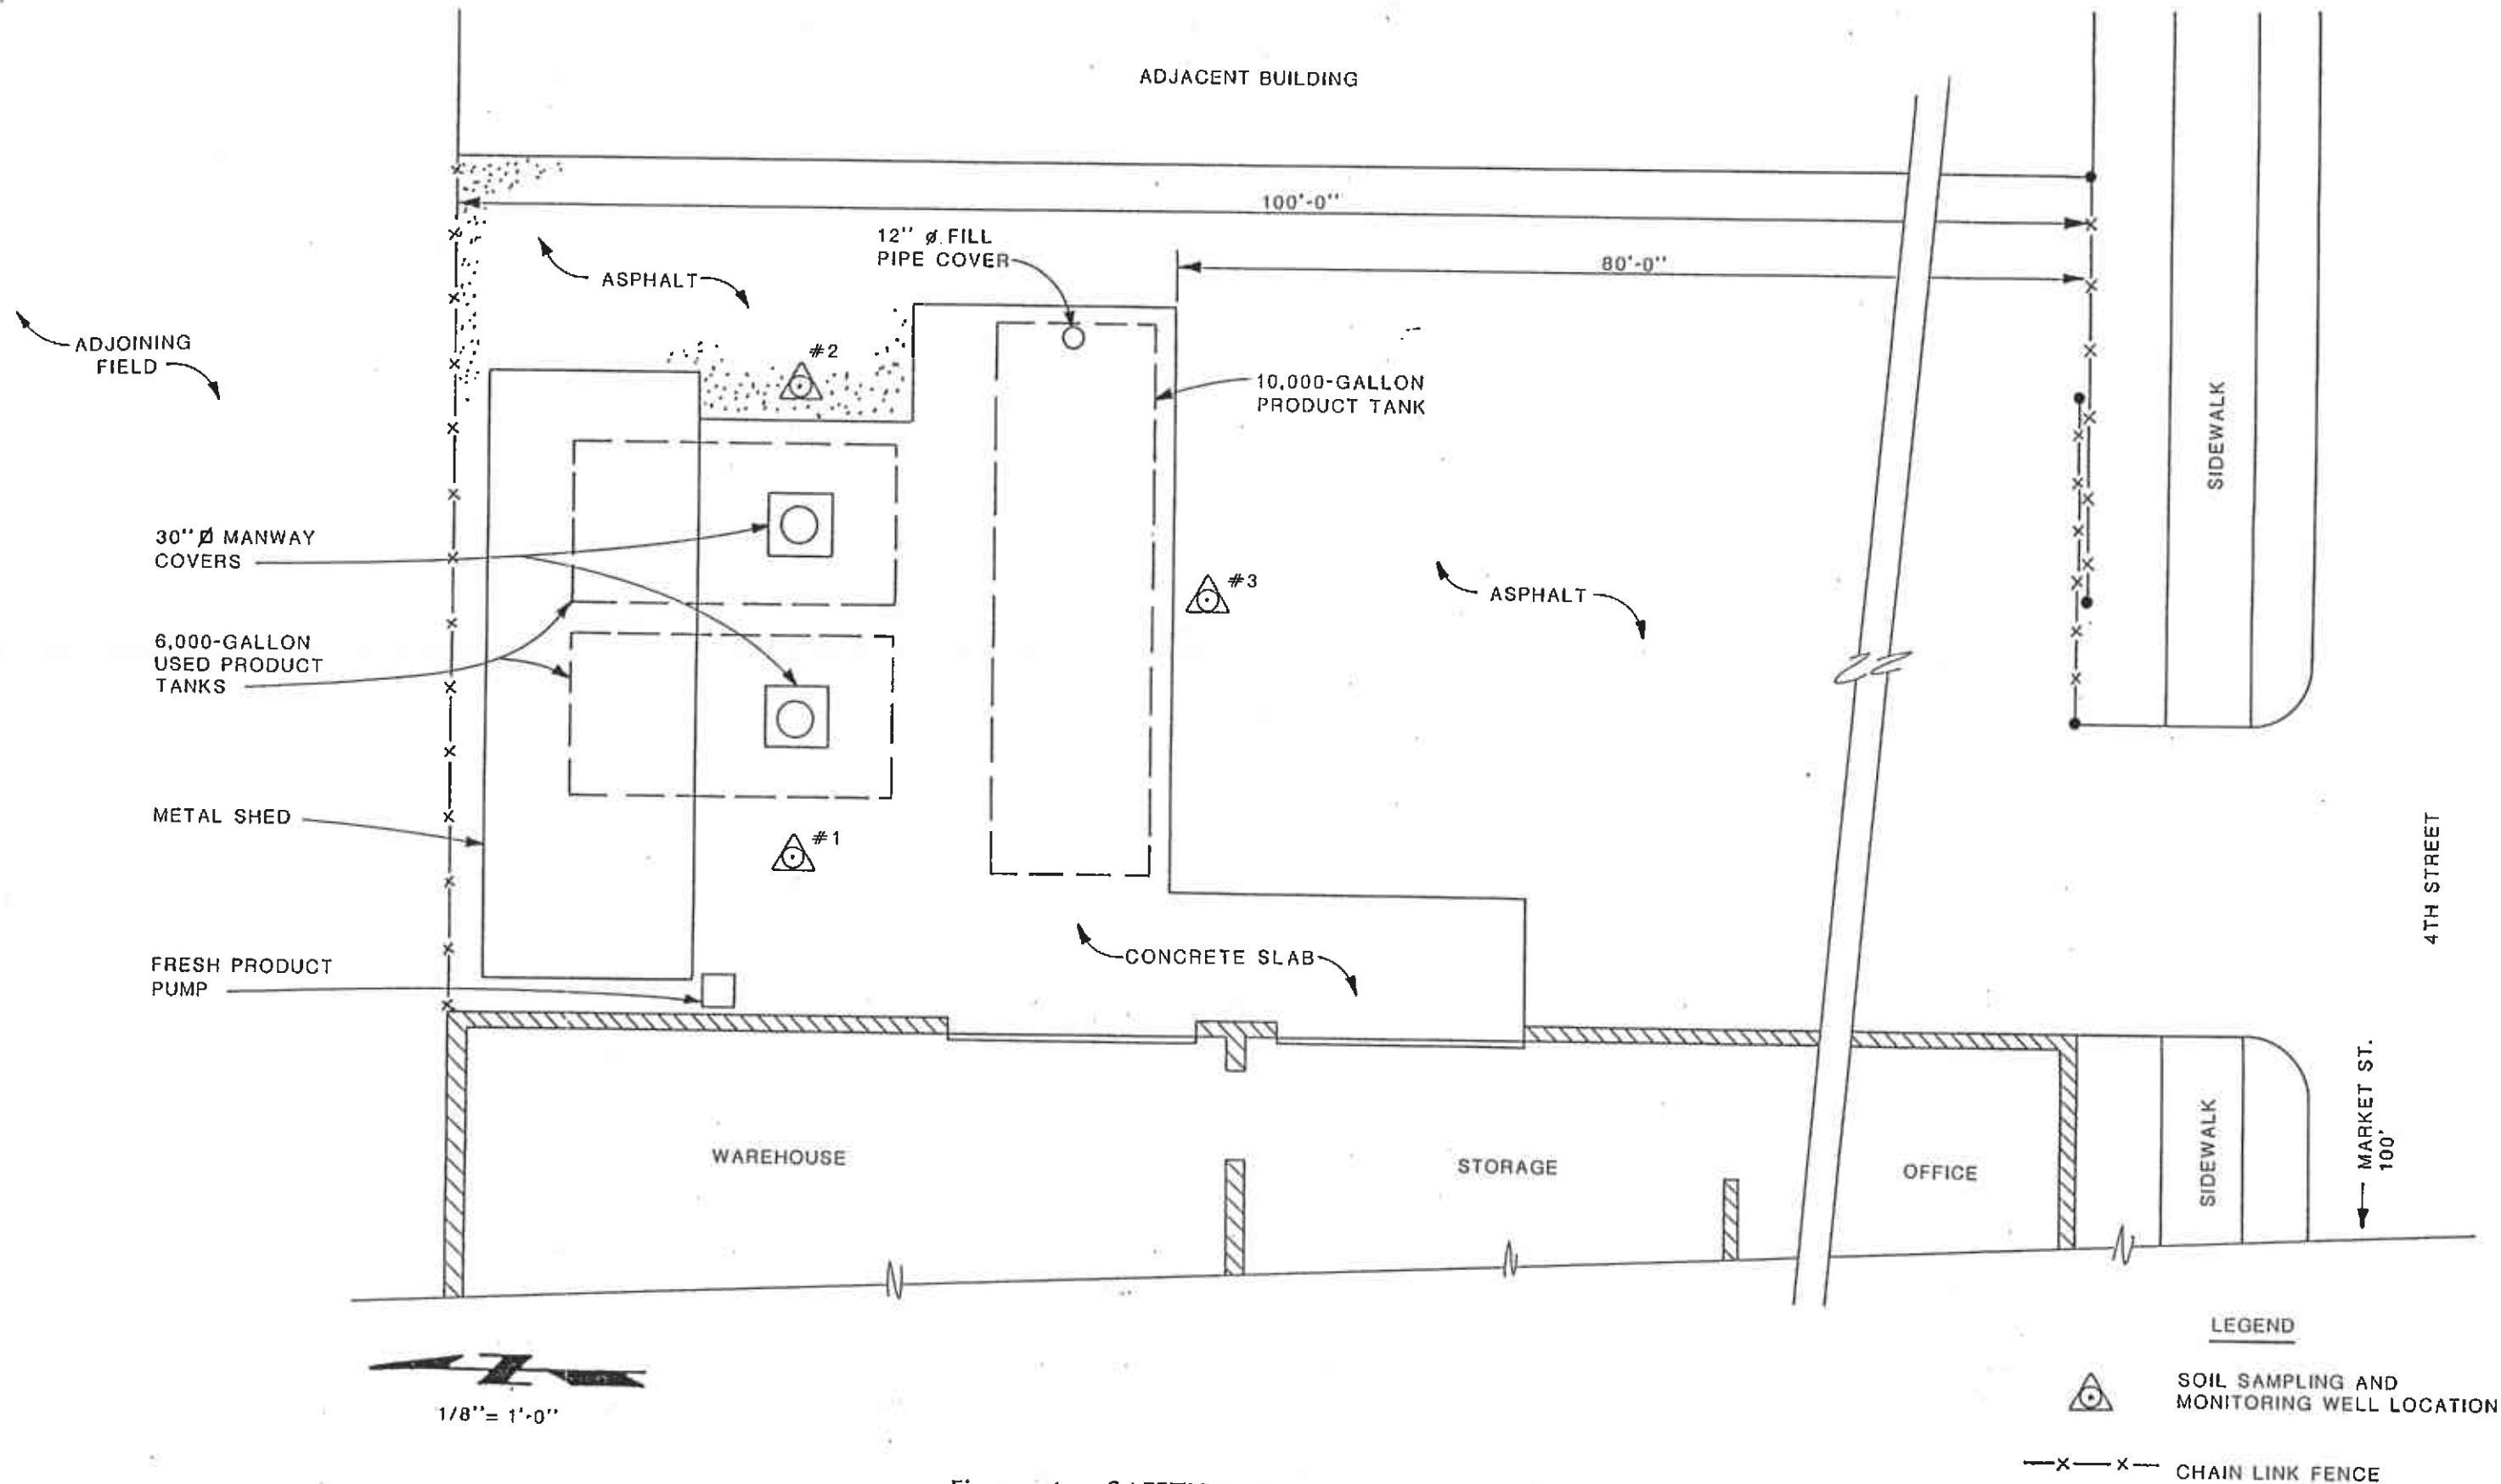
SAFETY-KLEEN SERVICE FACILITY SITE PLAN
